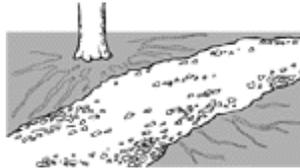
A root system bridge will help protect trees in the path of construction vehicles.
